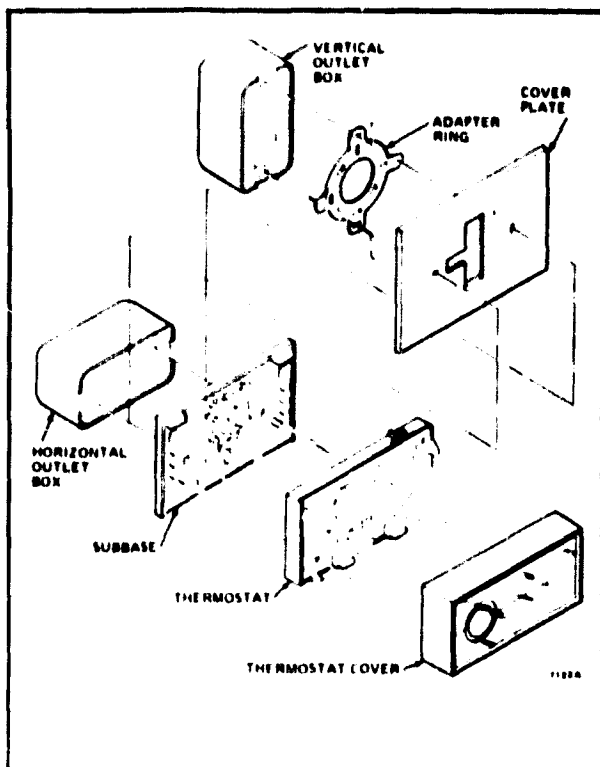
INSTALLATION OF Q672 SUBBASE ON OUTLET BOX.
